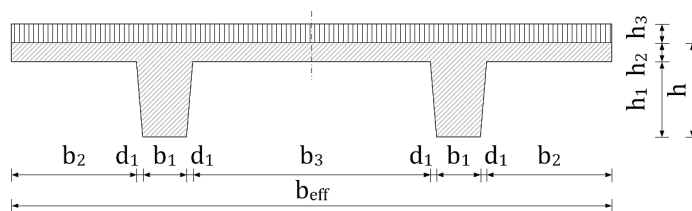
Cross section of a TT type pre-tensioned concrete slab
